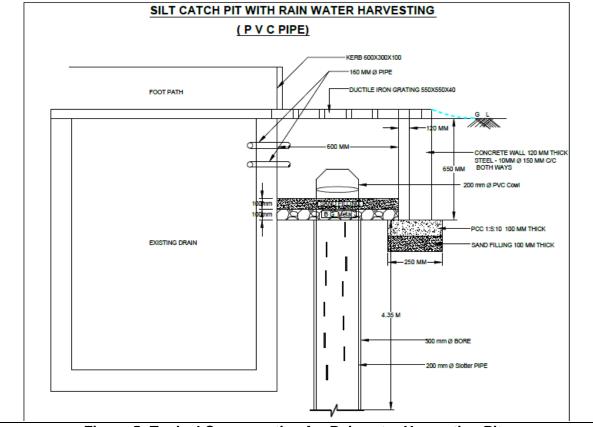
Typical Cross section for Rainwater Harvesting Pits
